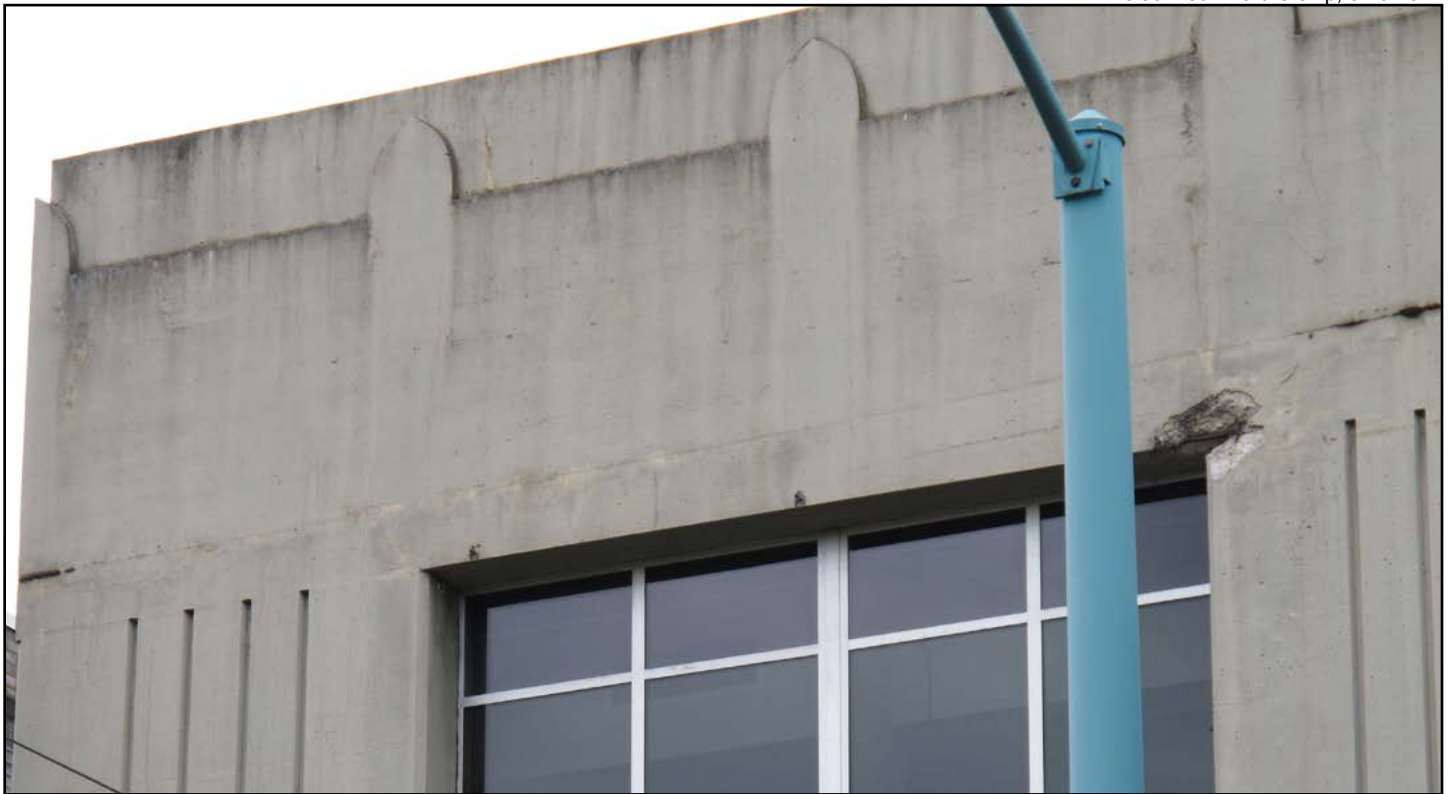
• Seattle Times Building Complex, detail of Printing Plant parapet
